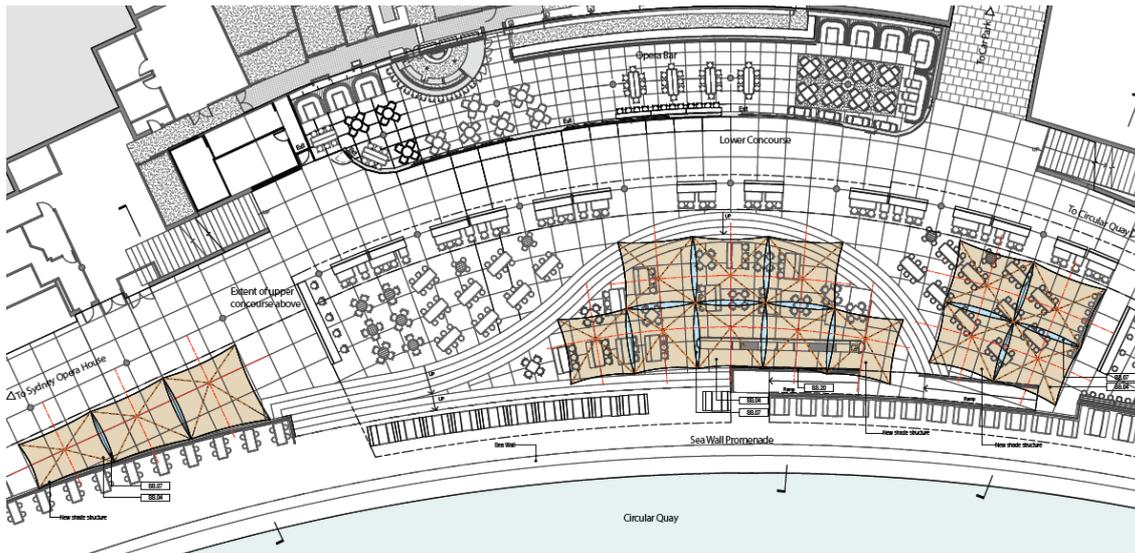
Proposed shade structures plan (Source: H&E Architecture)
